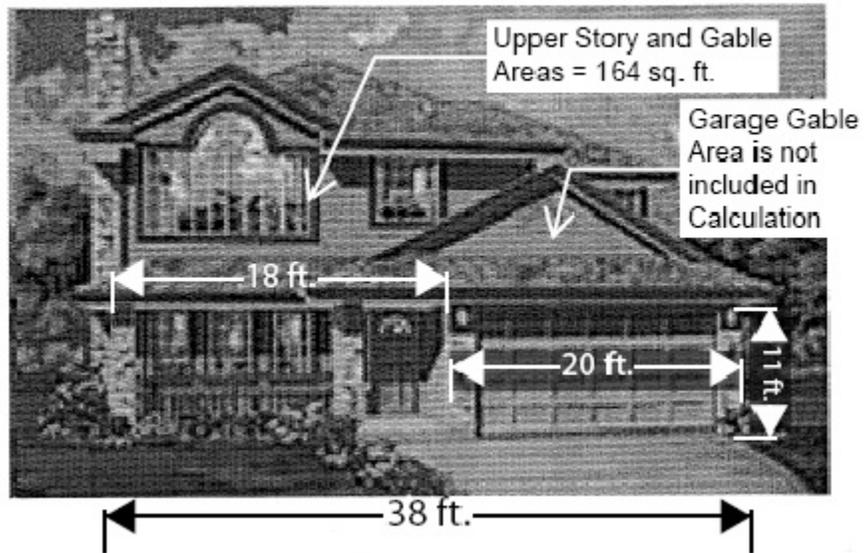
B - Acceptable Street-facing Garage Facade Area
